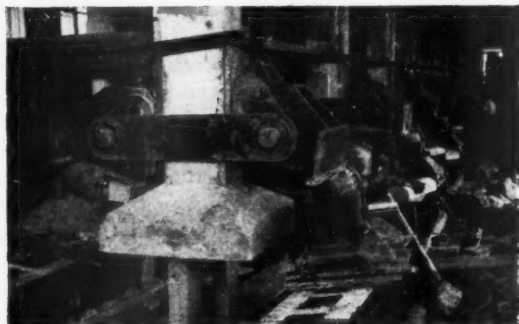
In the basement, a series of heavy steel cramps grip the columns just above the foundations, as the earth is removed from below and r.s.i.'s are inserted.
